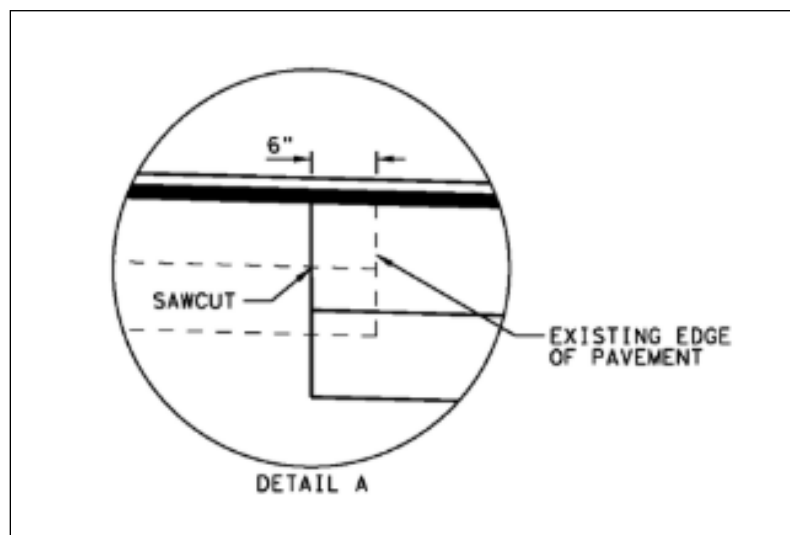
Intersection of Previous Pavement and New Pavement Structure, Project 3.
